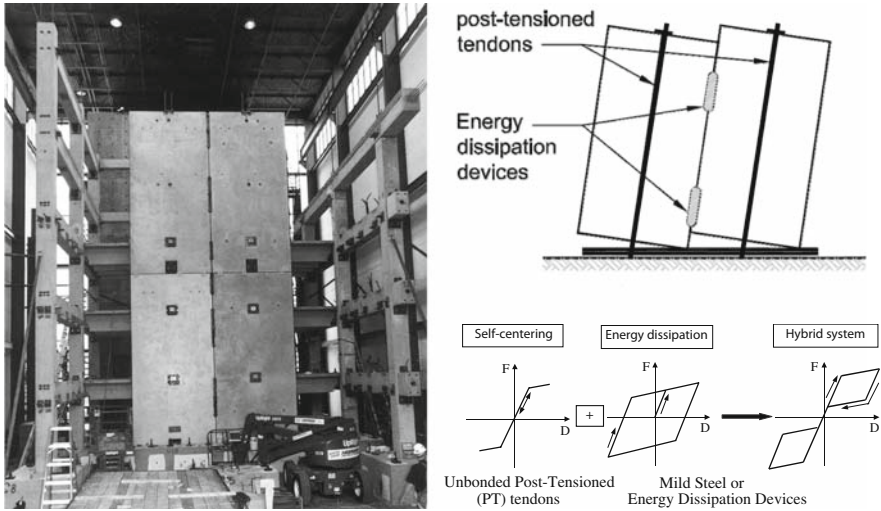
Jointed precast “hybrid” frame and wall connections developed in the US PRESSS-Program ([29, 30, 35,36])
